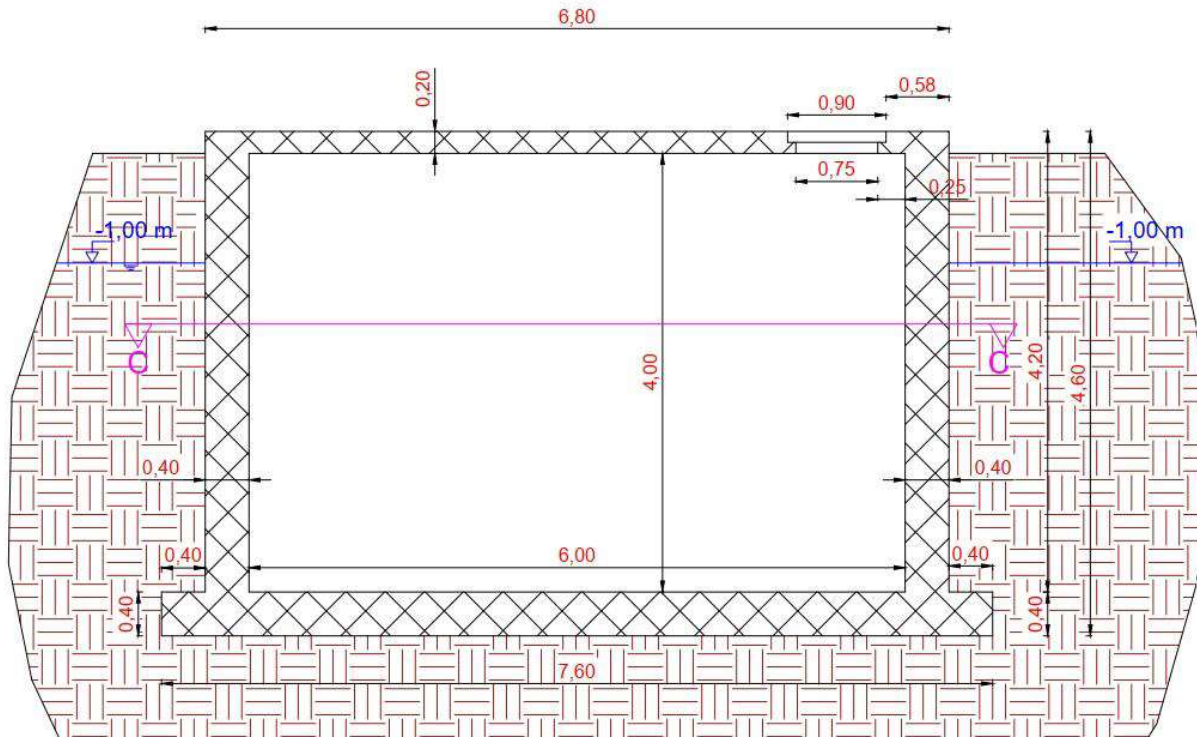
2. Cut B-B (Longitudinal view of the underground rectangular tank)
